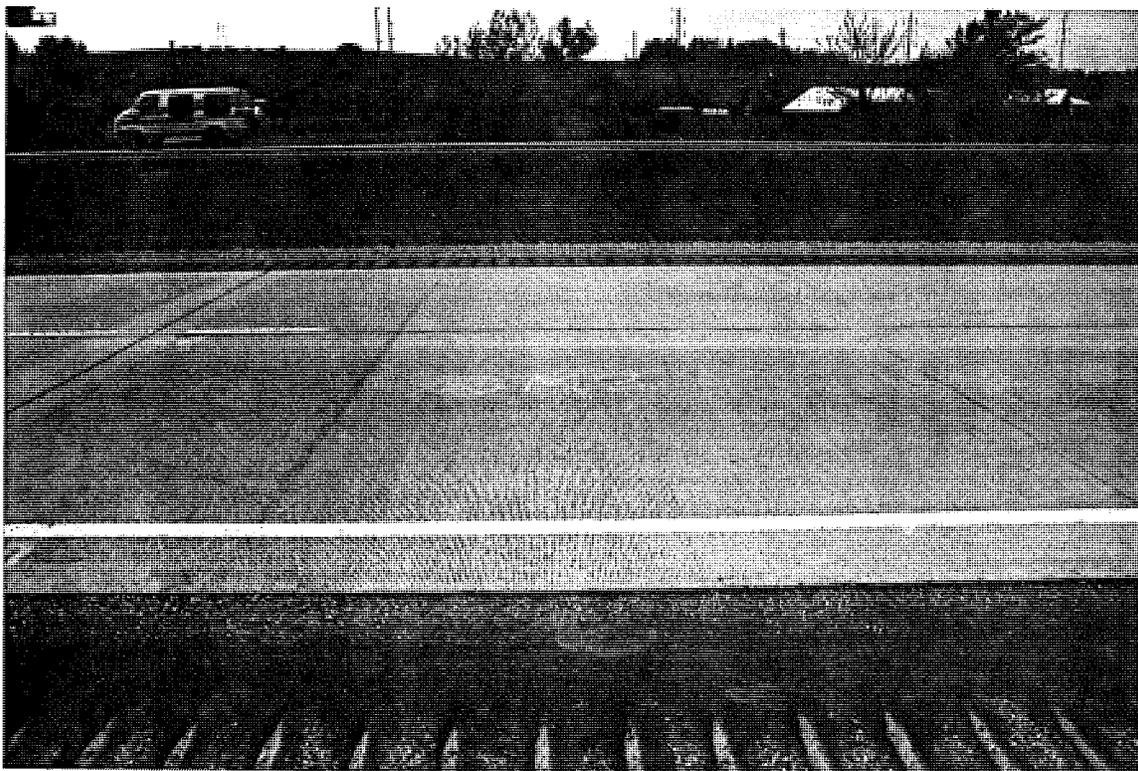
A transverse crack at midslab in CSN# 11017-32516A (Section C), EB. Moderate spalling is present.
